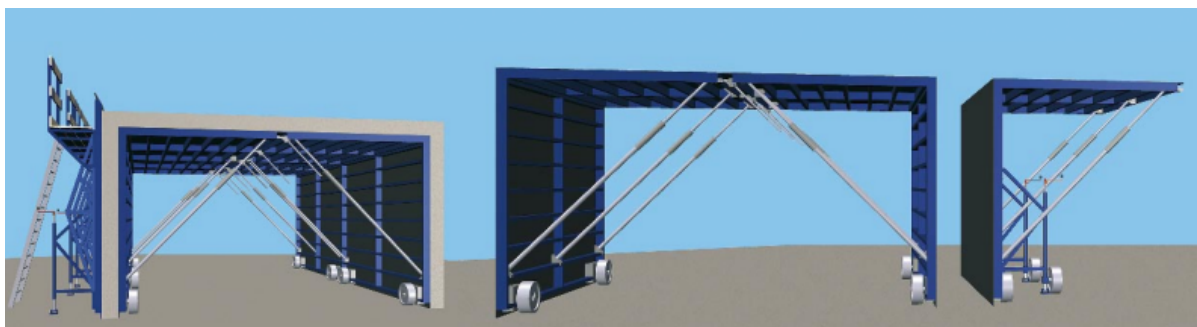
Tunnel formwork (Gietbouwcentrum, 2007)
